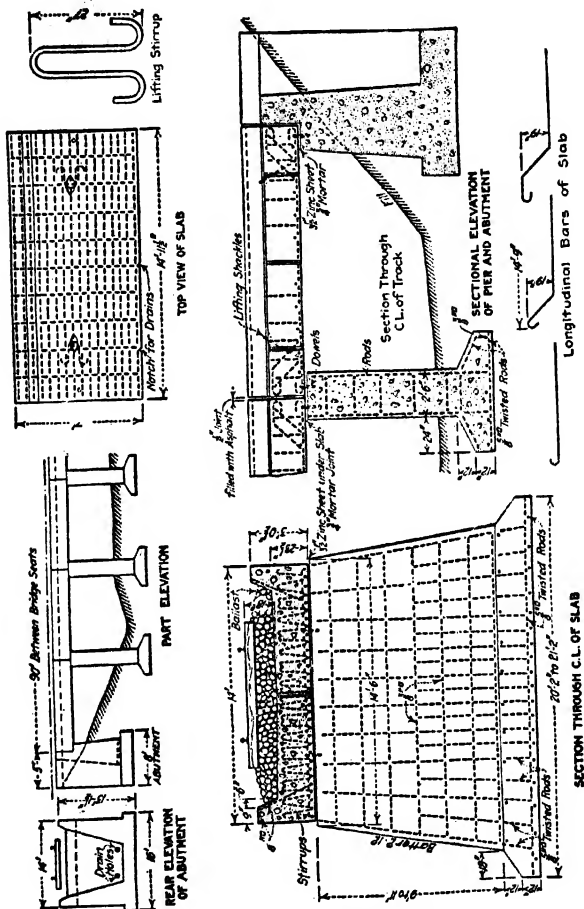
Reinforced concrete slab trestle of the K. C. S. R. R.
